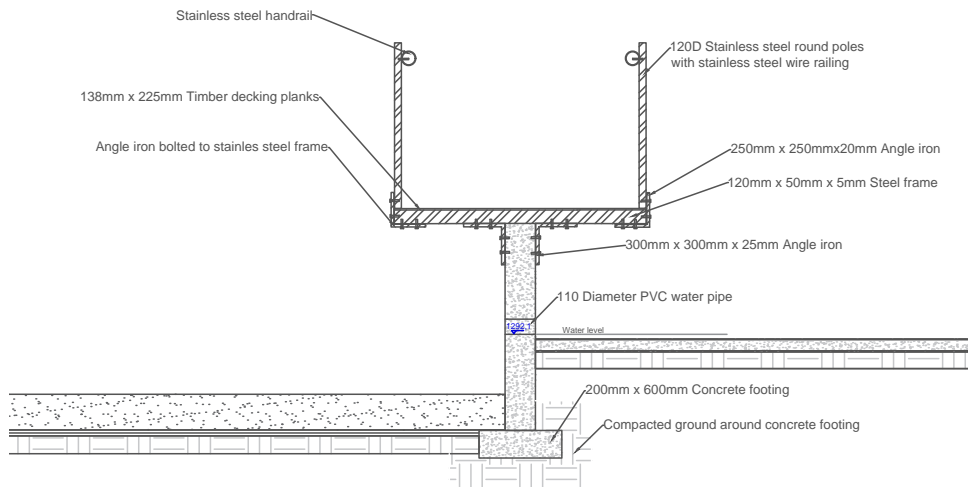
Detail section a - 2m wide pedestrian bridge across the off stream filter system (Author, 2018)
